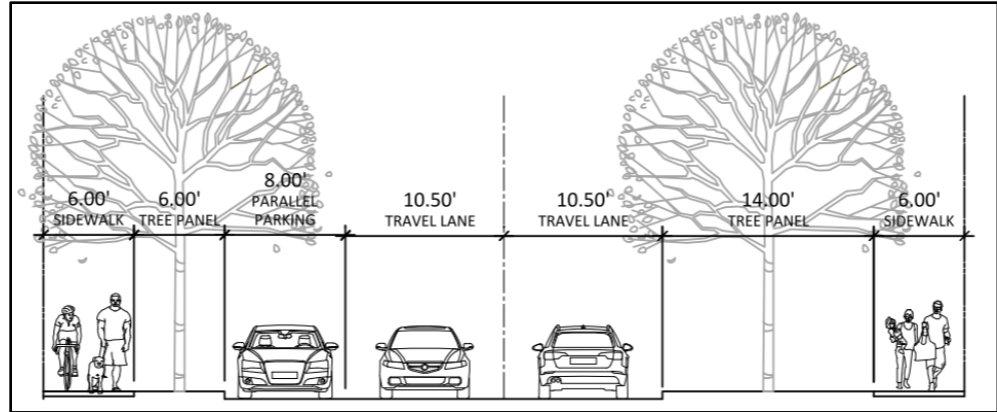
Proposed Cross-Section for Orange Segment of Street A, as conditioned.
